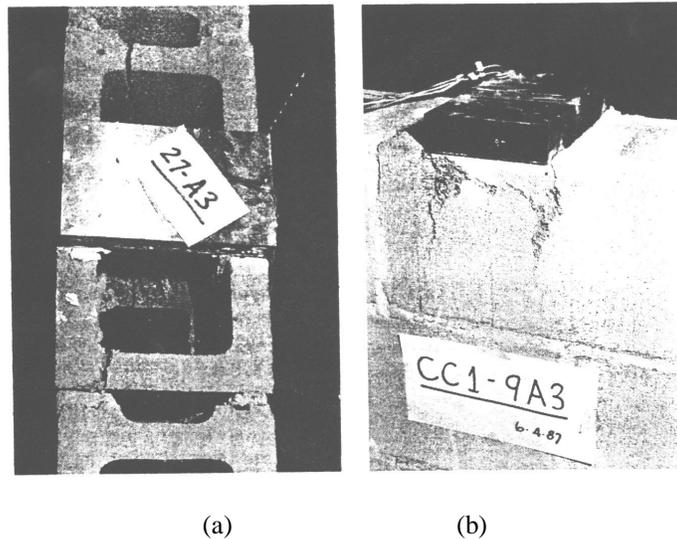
Failure modes of plain hollow concrete masonry walls subjected to concentrated load
